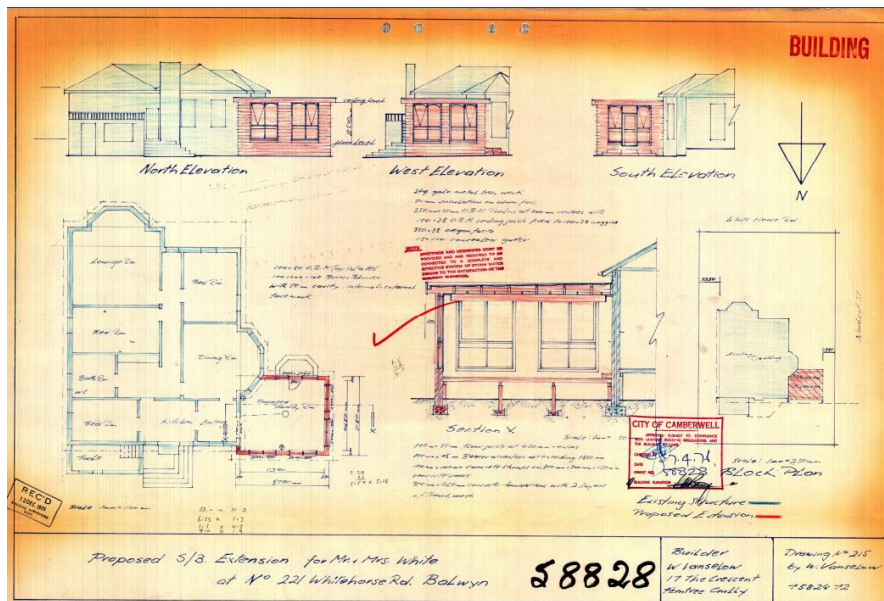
Drawing No. 215 by builder W Vanselow, depicting the proposed family room extension to 221 Whitehorse Road, Balwyn. The City of Camberwell approved the drawings in April 1976 and issued building permit no. 58828. (Source: Boroondara City Council)
